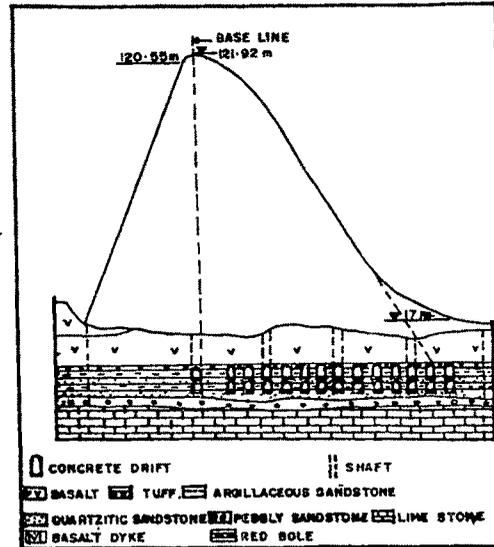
Typical Section of foundation treatment of argillaceous sandstone layers
